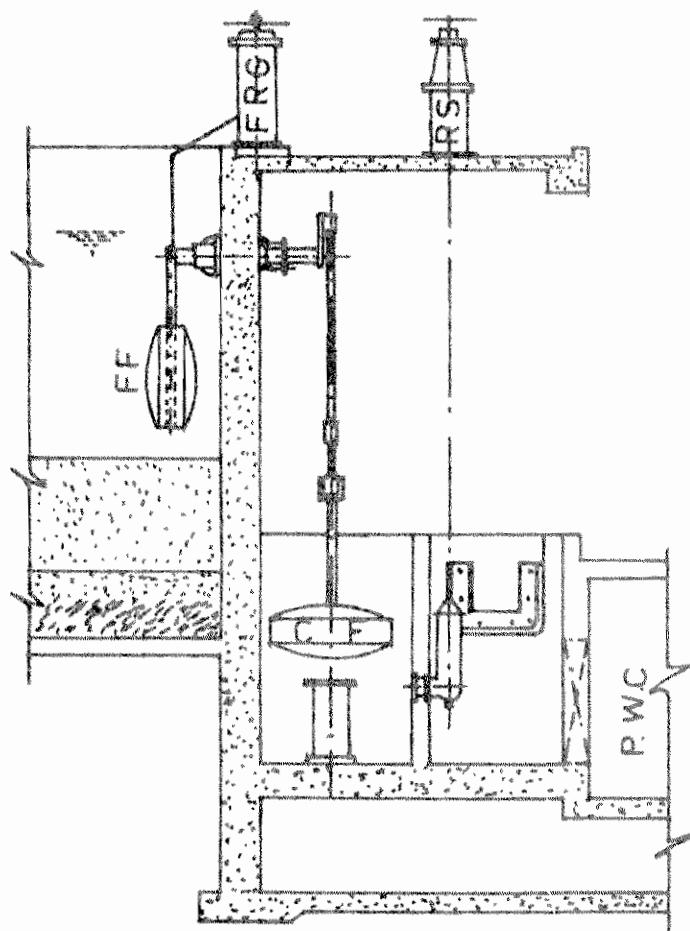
PLAN OF OUTLET CONTROLLER CHAMBER
